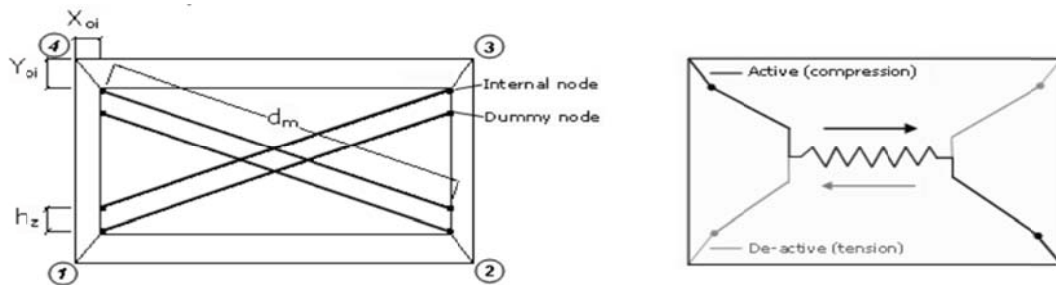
Infill panel element: a) Compression/Tension struts, b) Shear strut (Seismosoft 2014)
